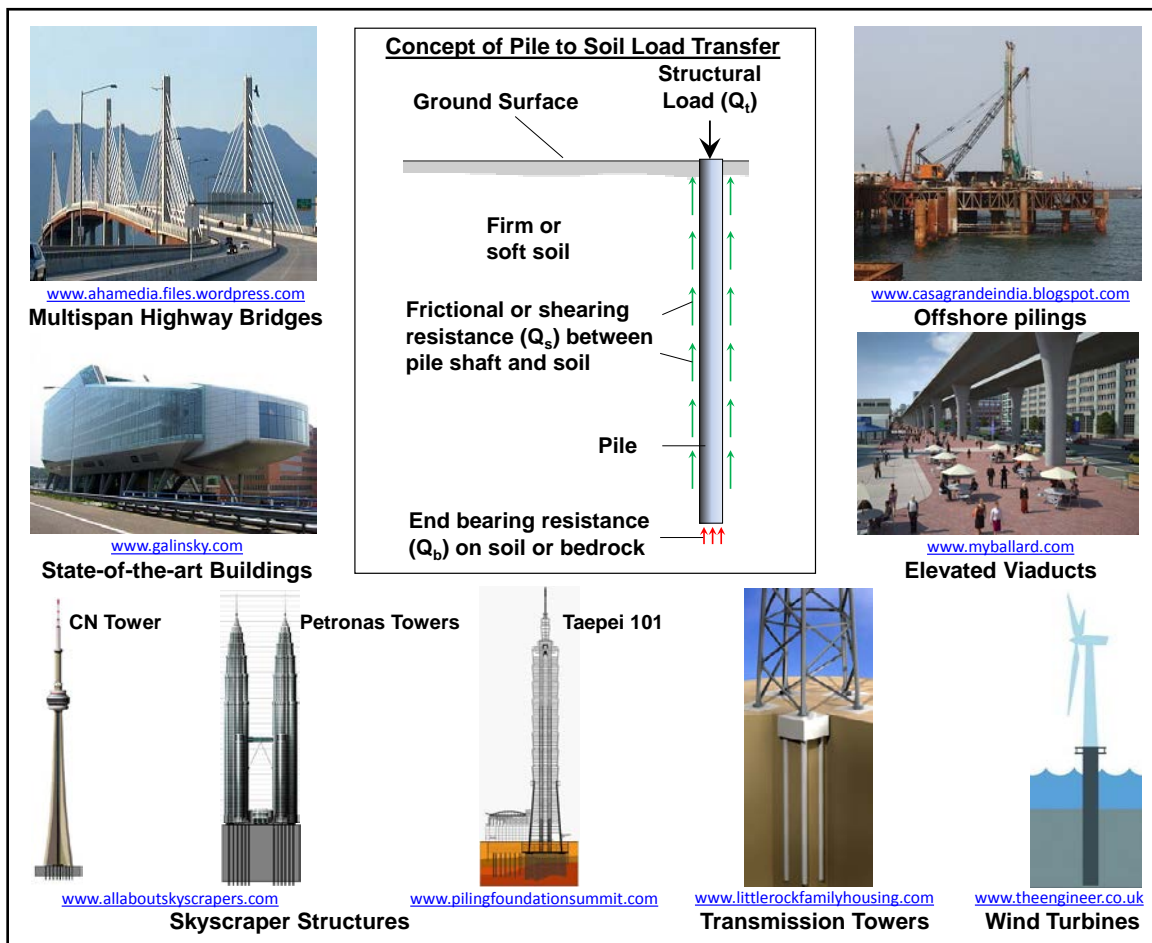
Examples of modern applications of pile foundations and the concept of pile-soil load transfer.
